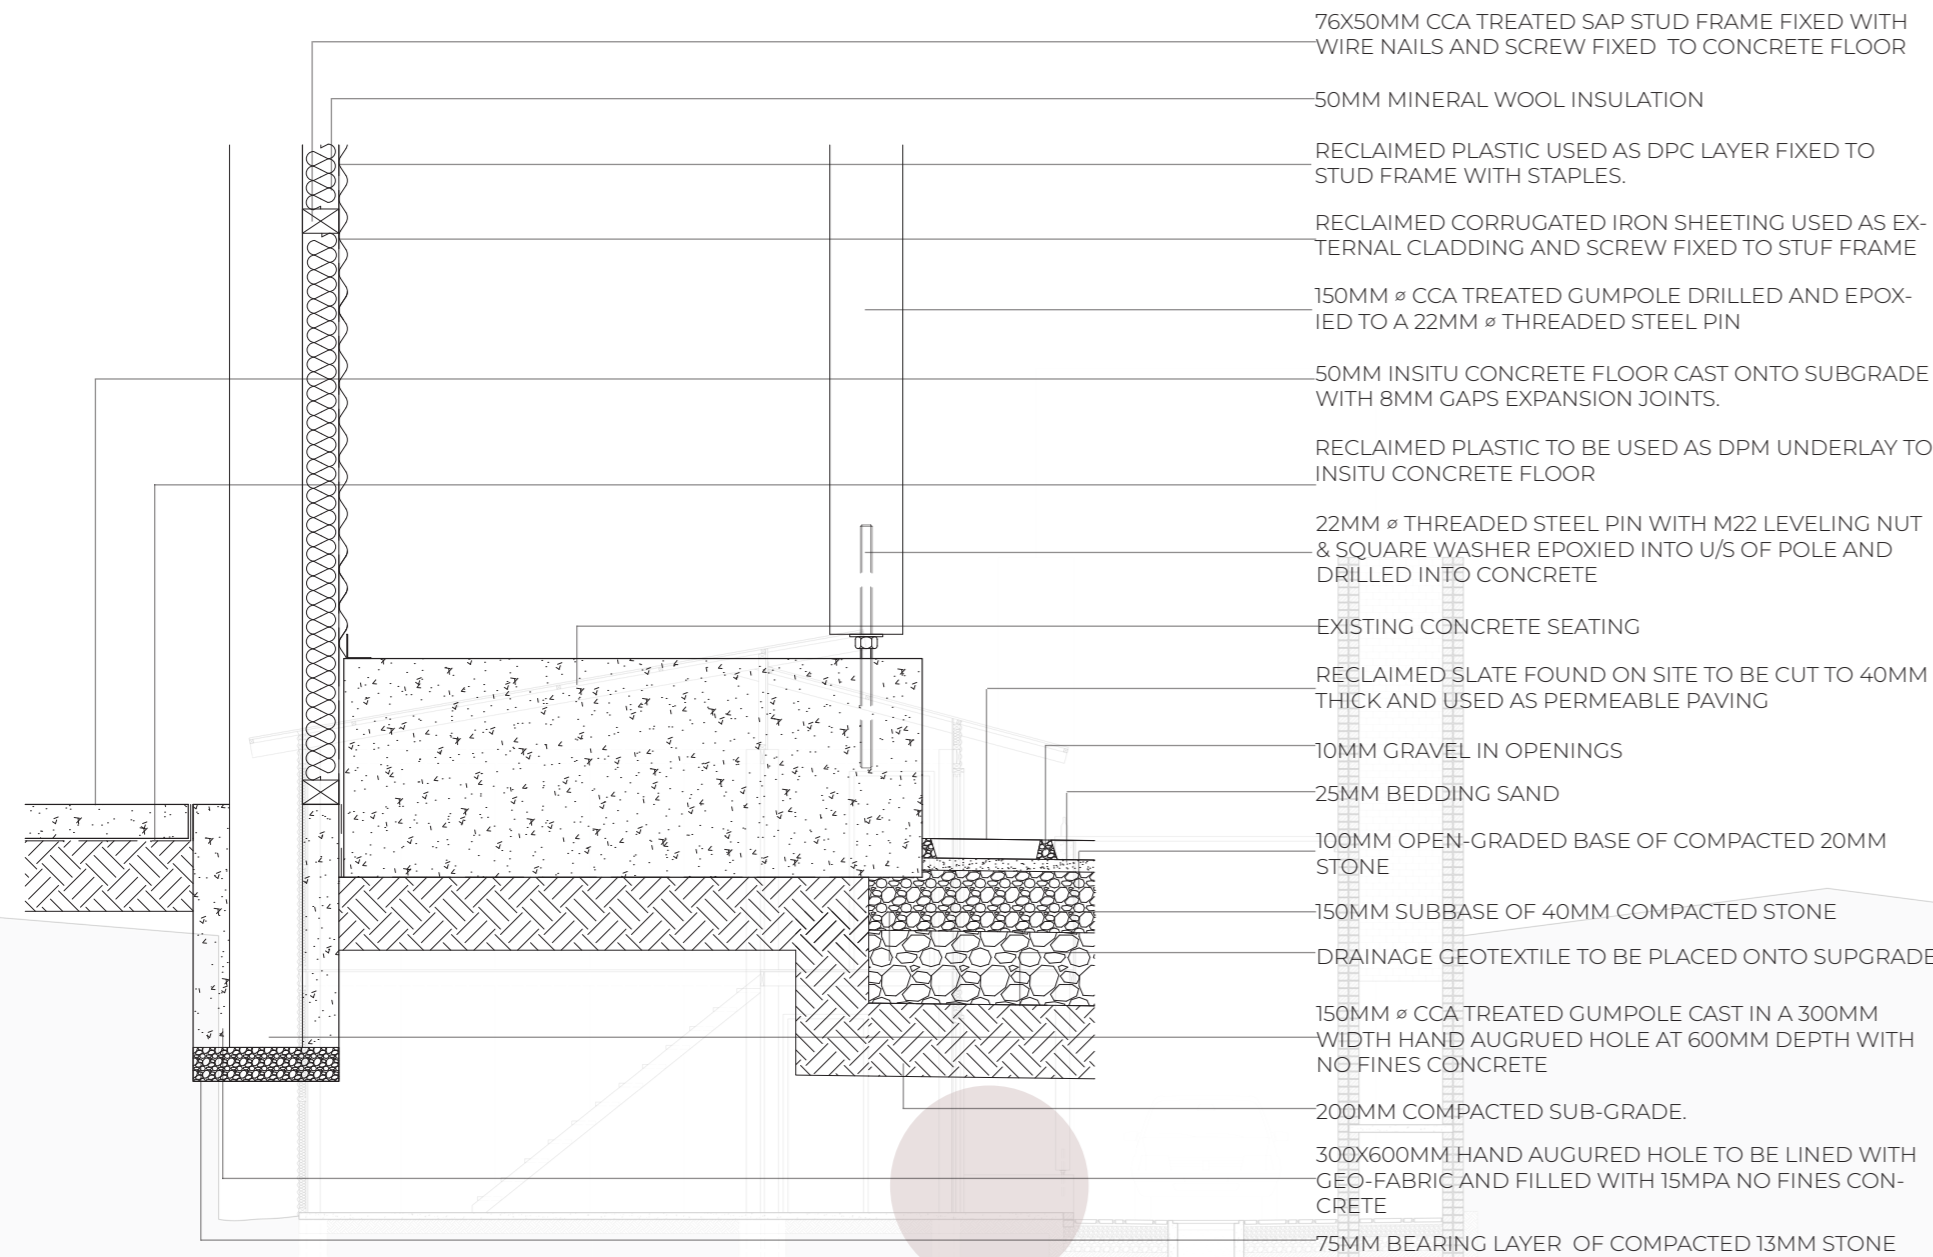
Detail 5 showing the foundations of Roy's dwelling (Author 2022)
